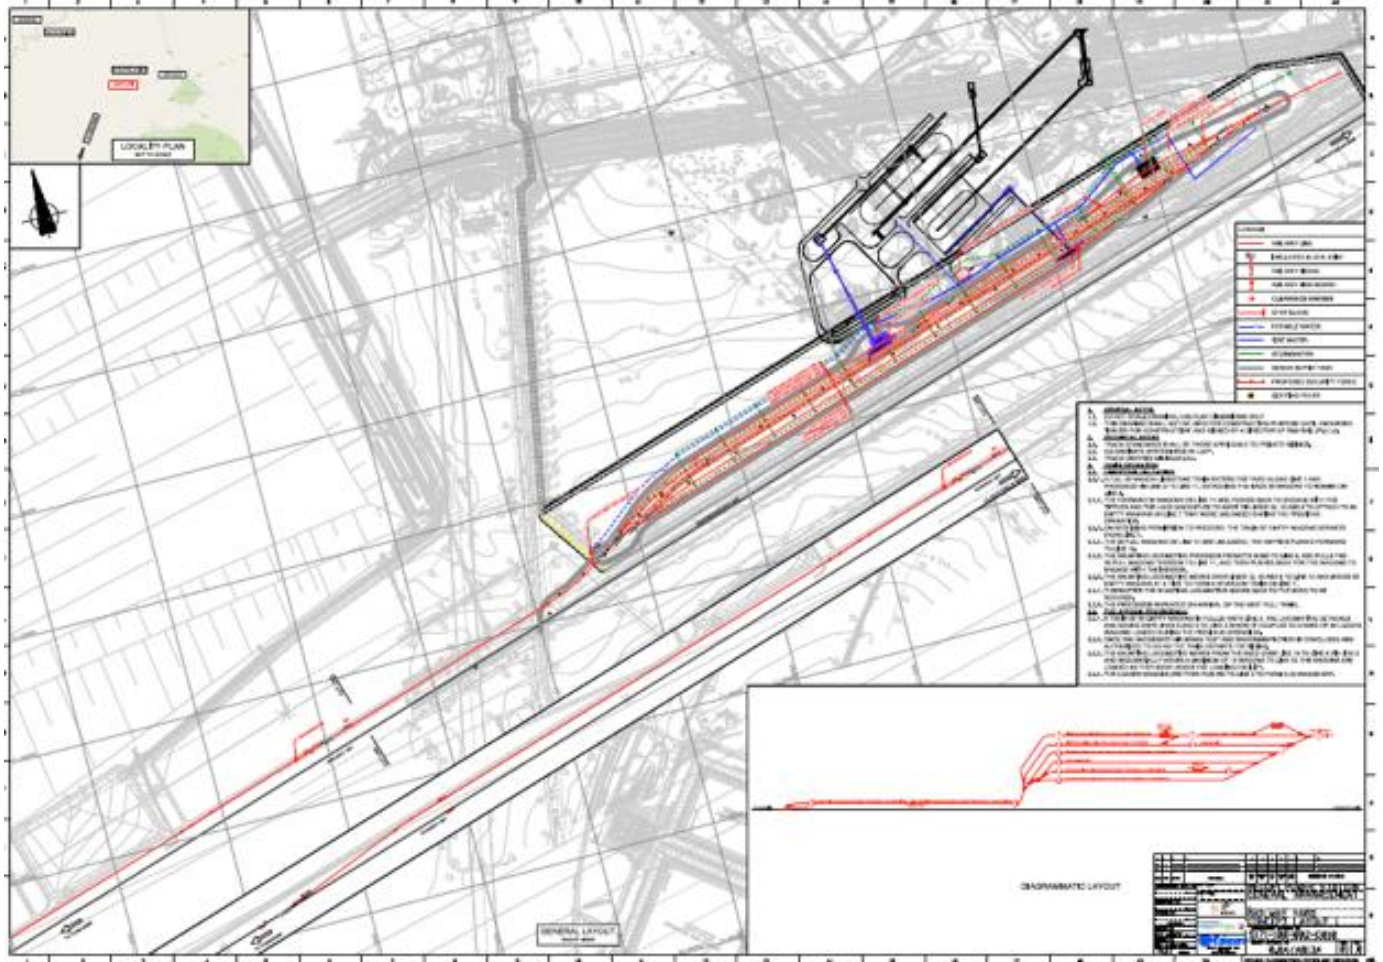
The proposed railway yard south-west of Medupi six units and south east of the existing and licensed ADF
